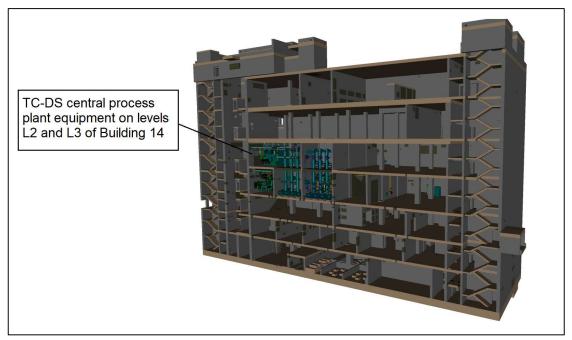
Cut section of B14 Tritium Building with TC-DS Central process plant on L2 and L3 shown
